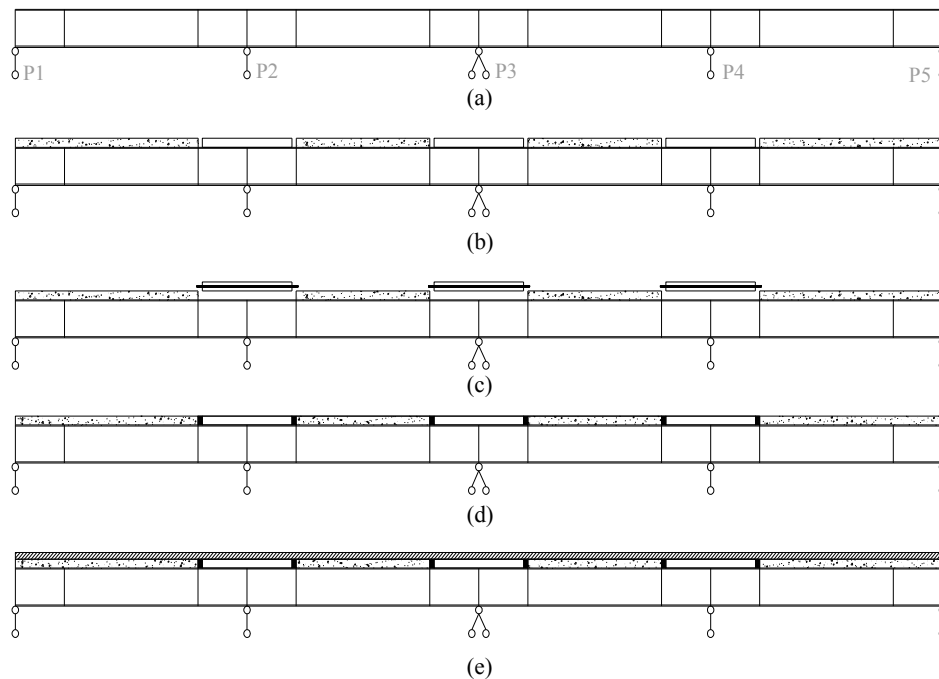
Construction sequence of the twin-I girder bridge: (a) Steel girder erection; (b) Precast concrete deck segments erection; (c) Prestressing concrete deck in the hogging regions; (d) Cast-in-place joints and void to connect girders and deck; (e) Constructed condition with the wearing surface and the attached appurtenance.
